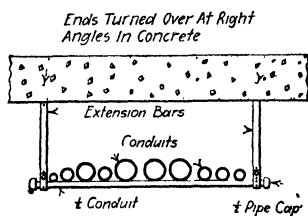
A simple scheme for supporting multiple conduit runs with perforated extension bar
